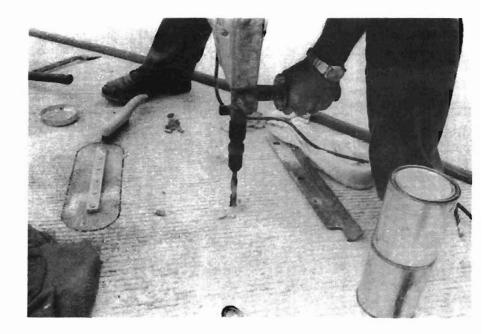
5. Installation of outside gauge plugs; drilling of "green" overlay concrete.
